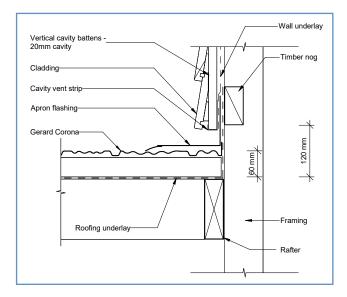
Positioning of apron flashing lap for installation
